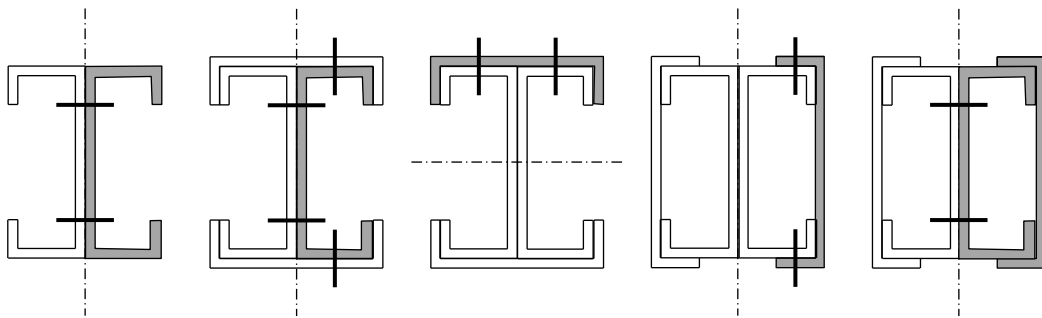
Examples of End Connections Participating in Shear
